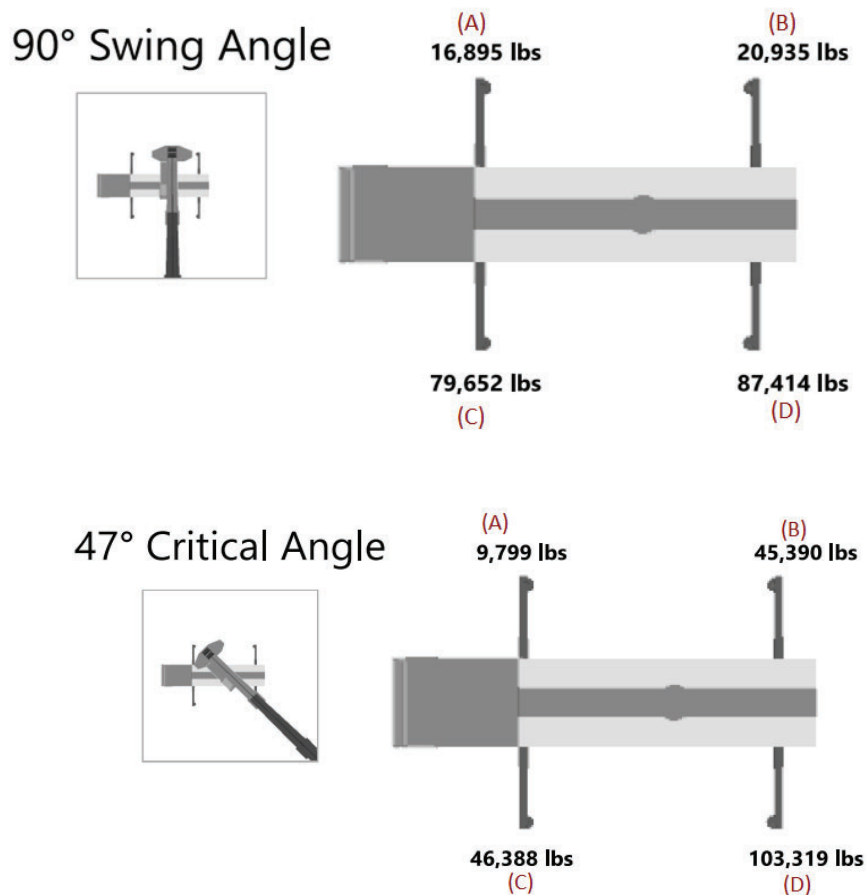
GROUND BEARING PRESSURES UNDER OUTRIGGERS
